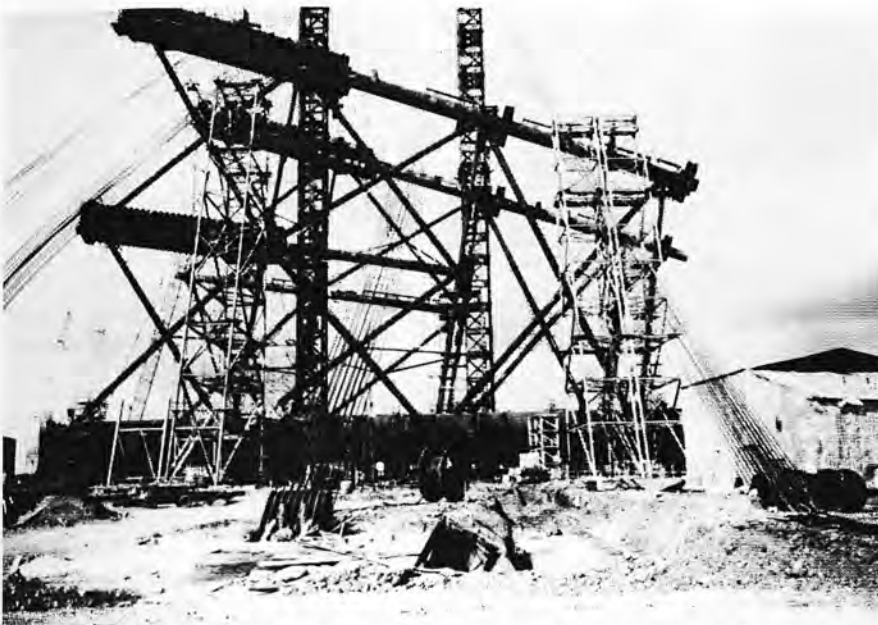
To provide a reaction to enable lifting of heavy structural members into place on the Brent 'A' jacket, four reinforced concrete blocks were prestressed into the ground with a force of 5000 kN each.
